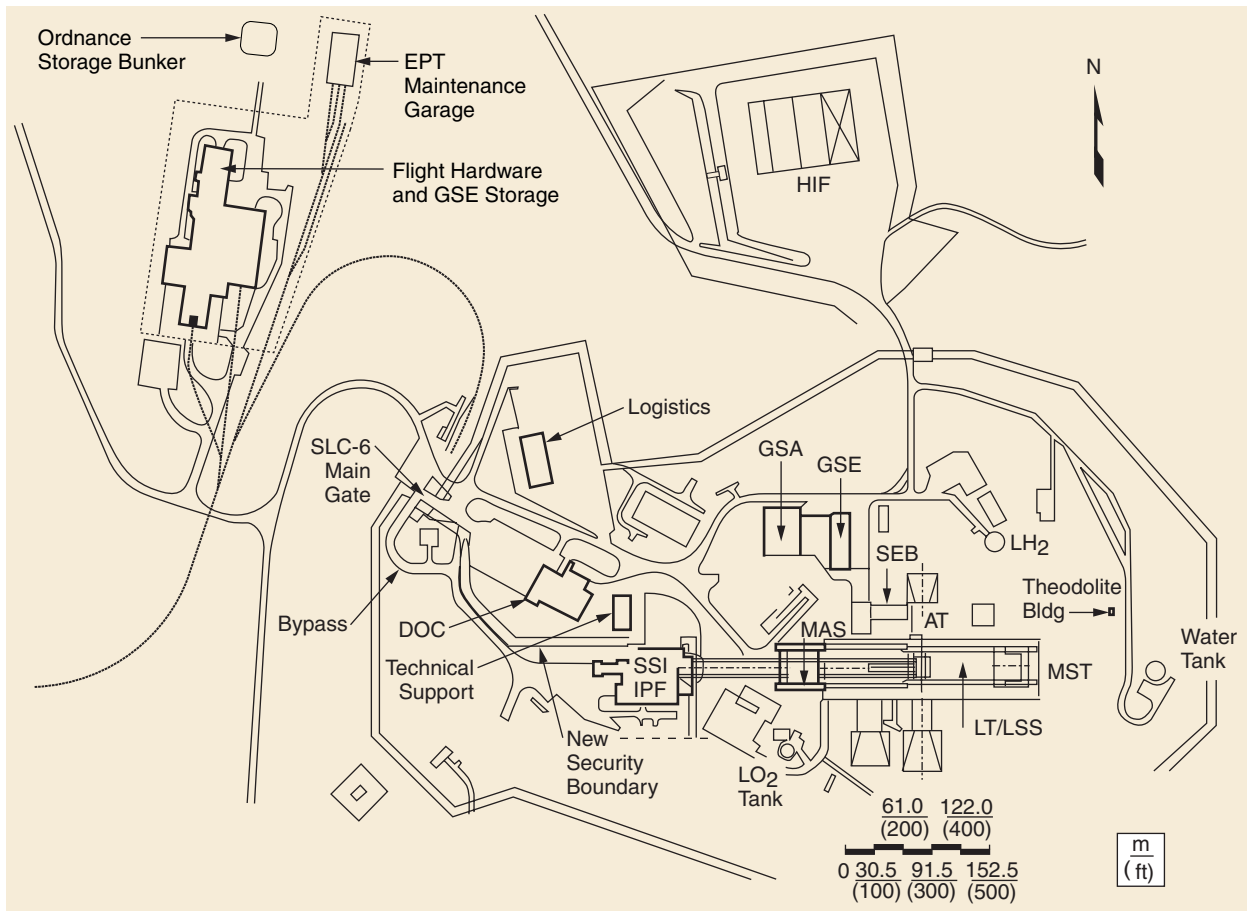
Space Launch Complex 6, VAFB Site Plan
